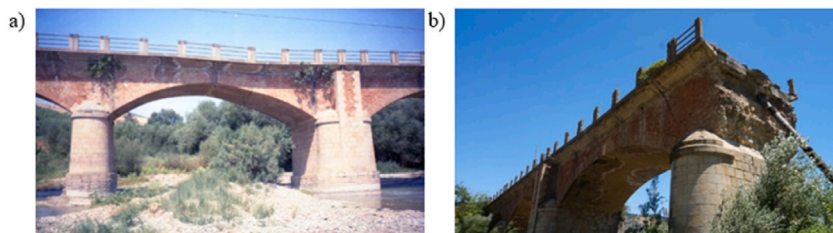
a) Deformed arch of the bridge before the collapse; b) Arch of the bridge after the collapse [16].
